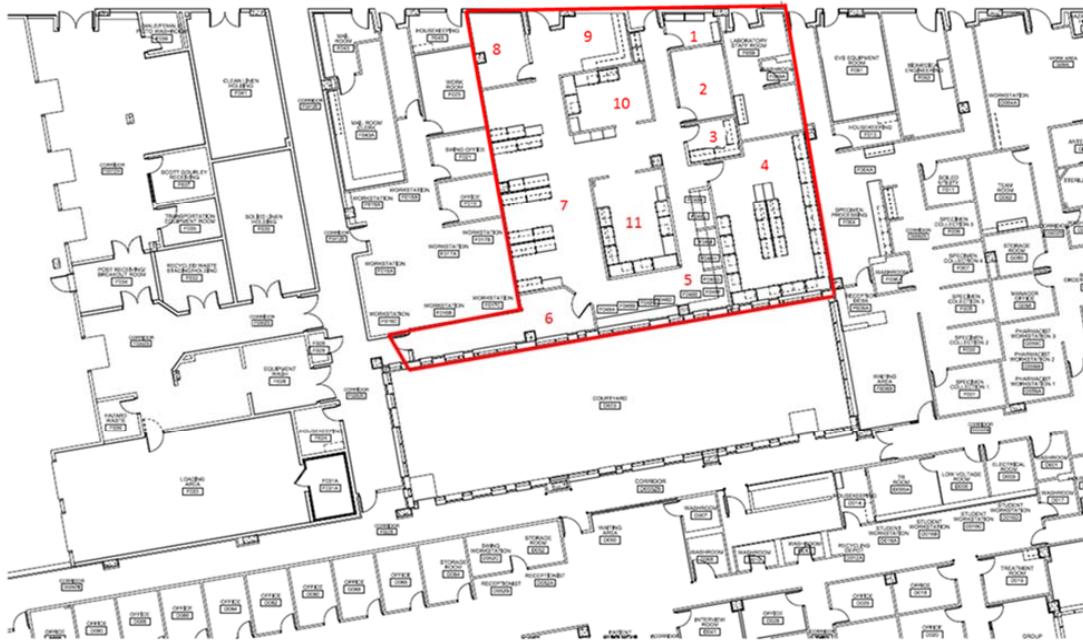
Floor plan of the basement in the West Fifth Site at SJHH. 1. Storage room; 2. Conference room; 3. Microscopy Analysis; 4. Lab work area; 5. 12 workstations for data processing; 6. Waste collection; 7. Bench work area; 8. Brain Tissue Storage; 9. Sample preparation; 10. Cell culture room; 11. Molecular and Protein analysis. All required equipment to run a state-of-the-art translational neuroscience laboratory are already in place. The remaining pieces of equipment will be purchased with SJHH Foundation and CFI grants - active.
